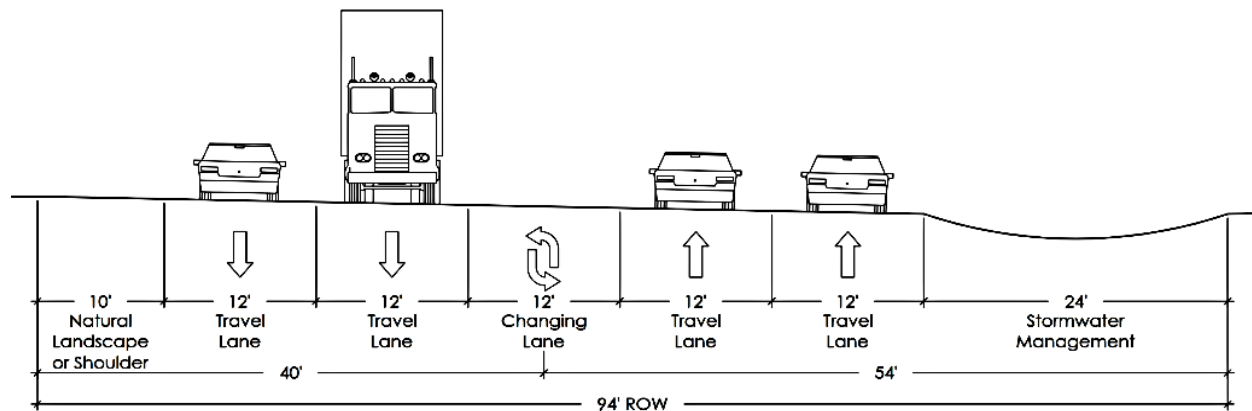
W. Marshall Road (looking east) Cross Section for Segment Adjacent to CLIBP
